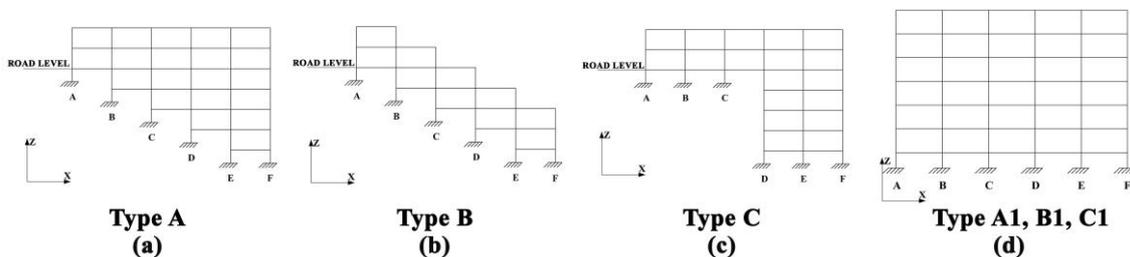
Elevation of the considered building (a) Type A (b) Type B (c) Type C (d) Type (A1, B1 and C1)
